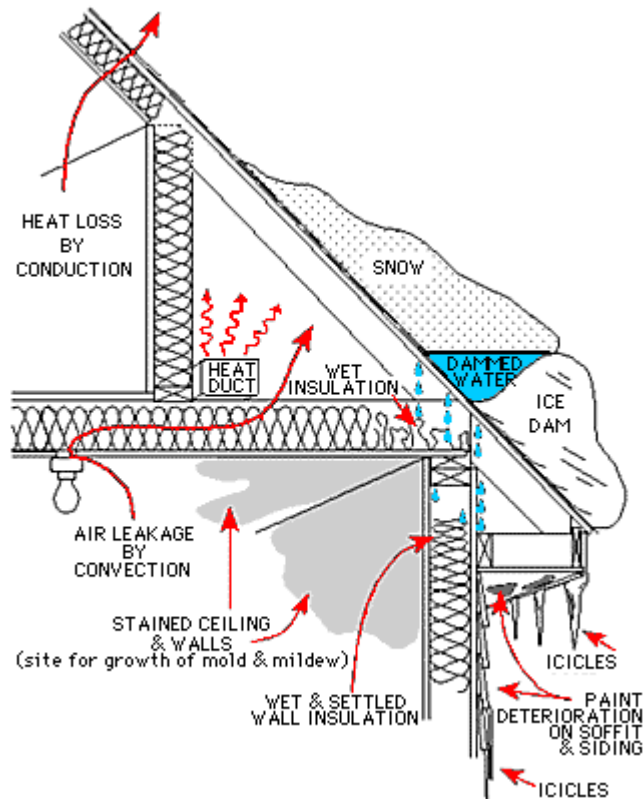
Cross section of a one-and-a-half story house with an ice dam.
